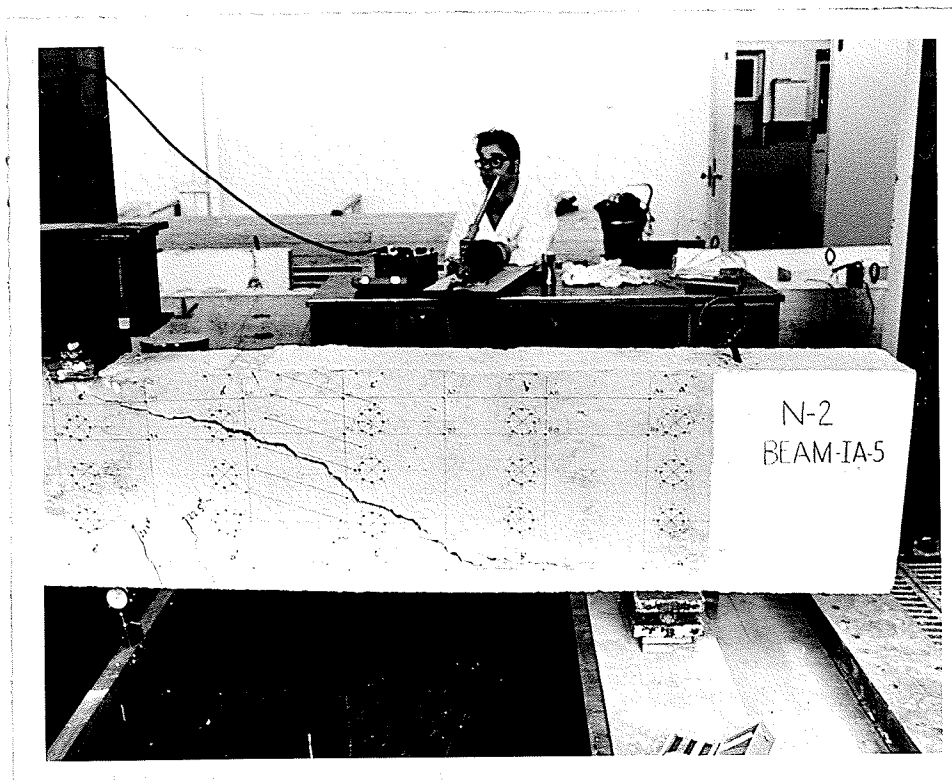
DIAGONAL FAILURE OF BEAM IA-5
